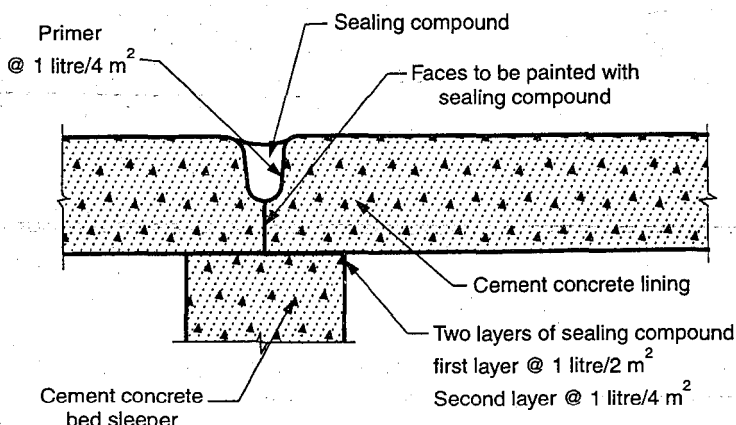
Commonly adopted construction joints in cement concrete lining (IS : 3873-1978).
